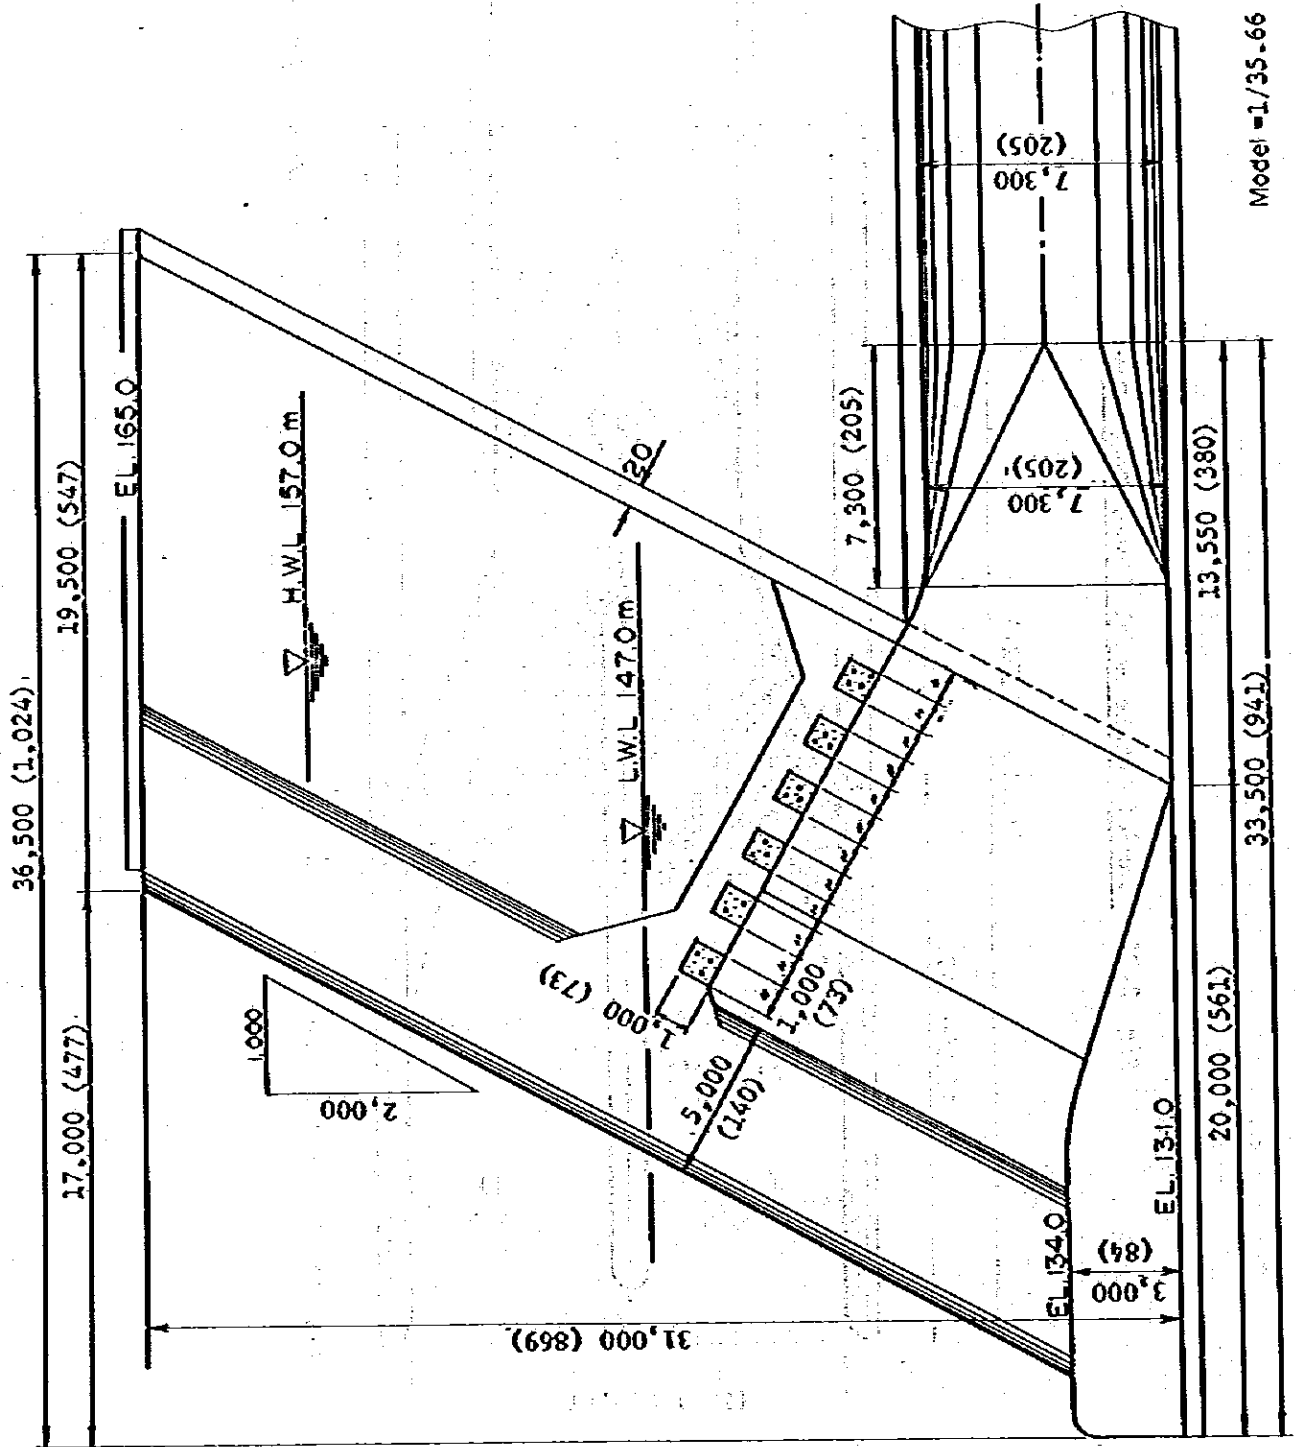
Plan of Intake Model (Upper Tekraf Dam)
